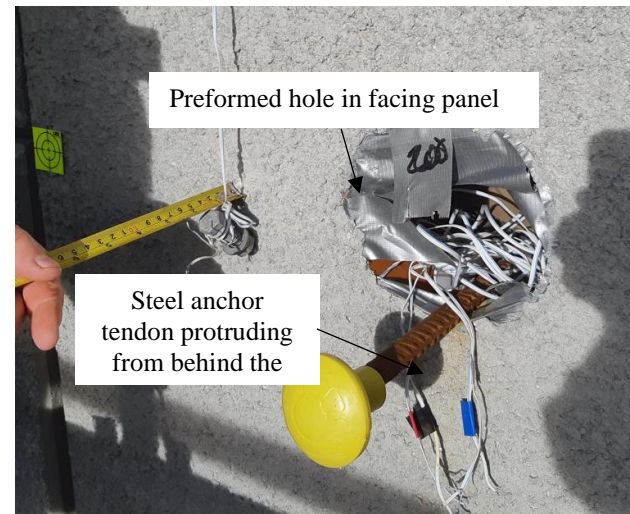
Anchor tendon protruding at face of wall through preformed hole in facing panel.
